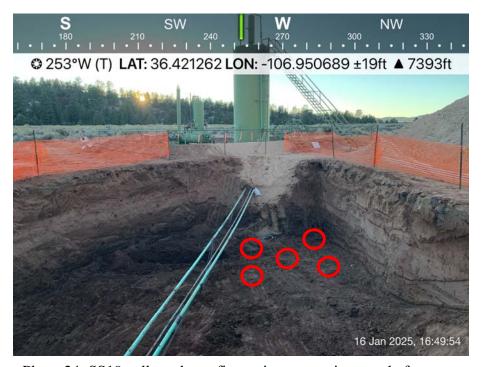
SS19 collected as a five-point composite sample from northwest base of excavation.
